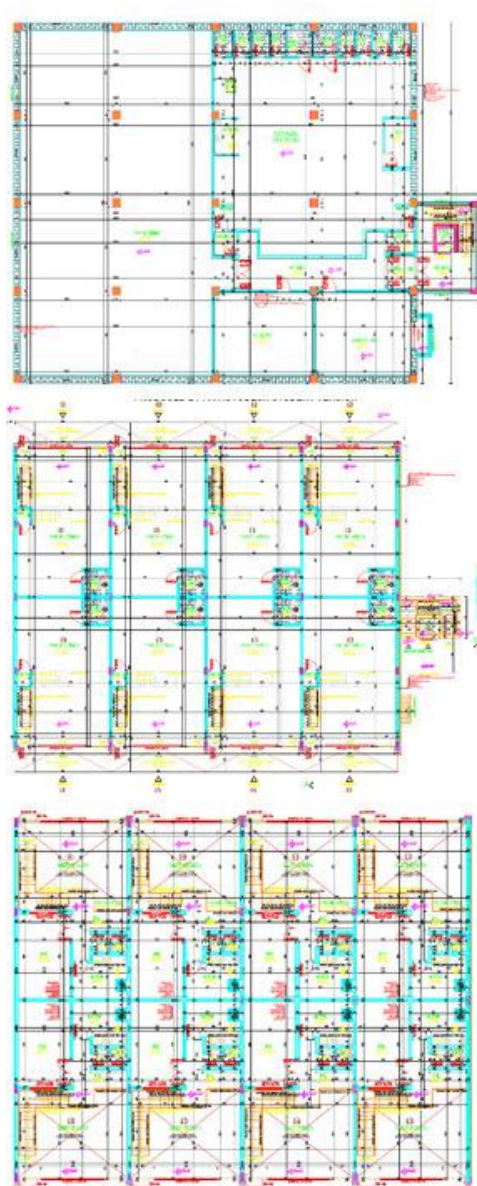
Basement, Ground and Mezzanine Floor Plans.
